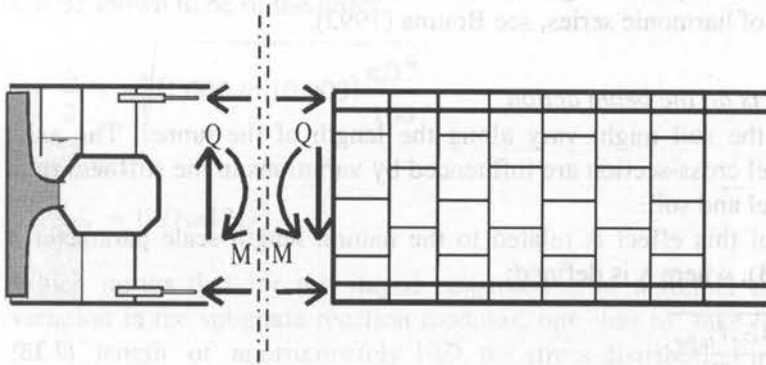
Loading of the tunnel beam by the tunnel boring machine
